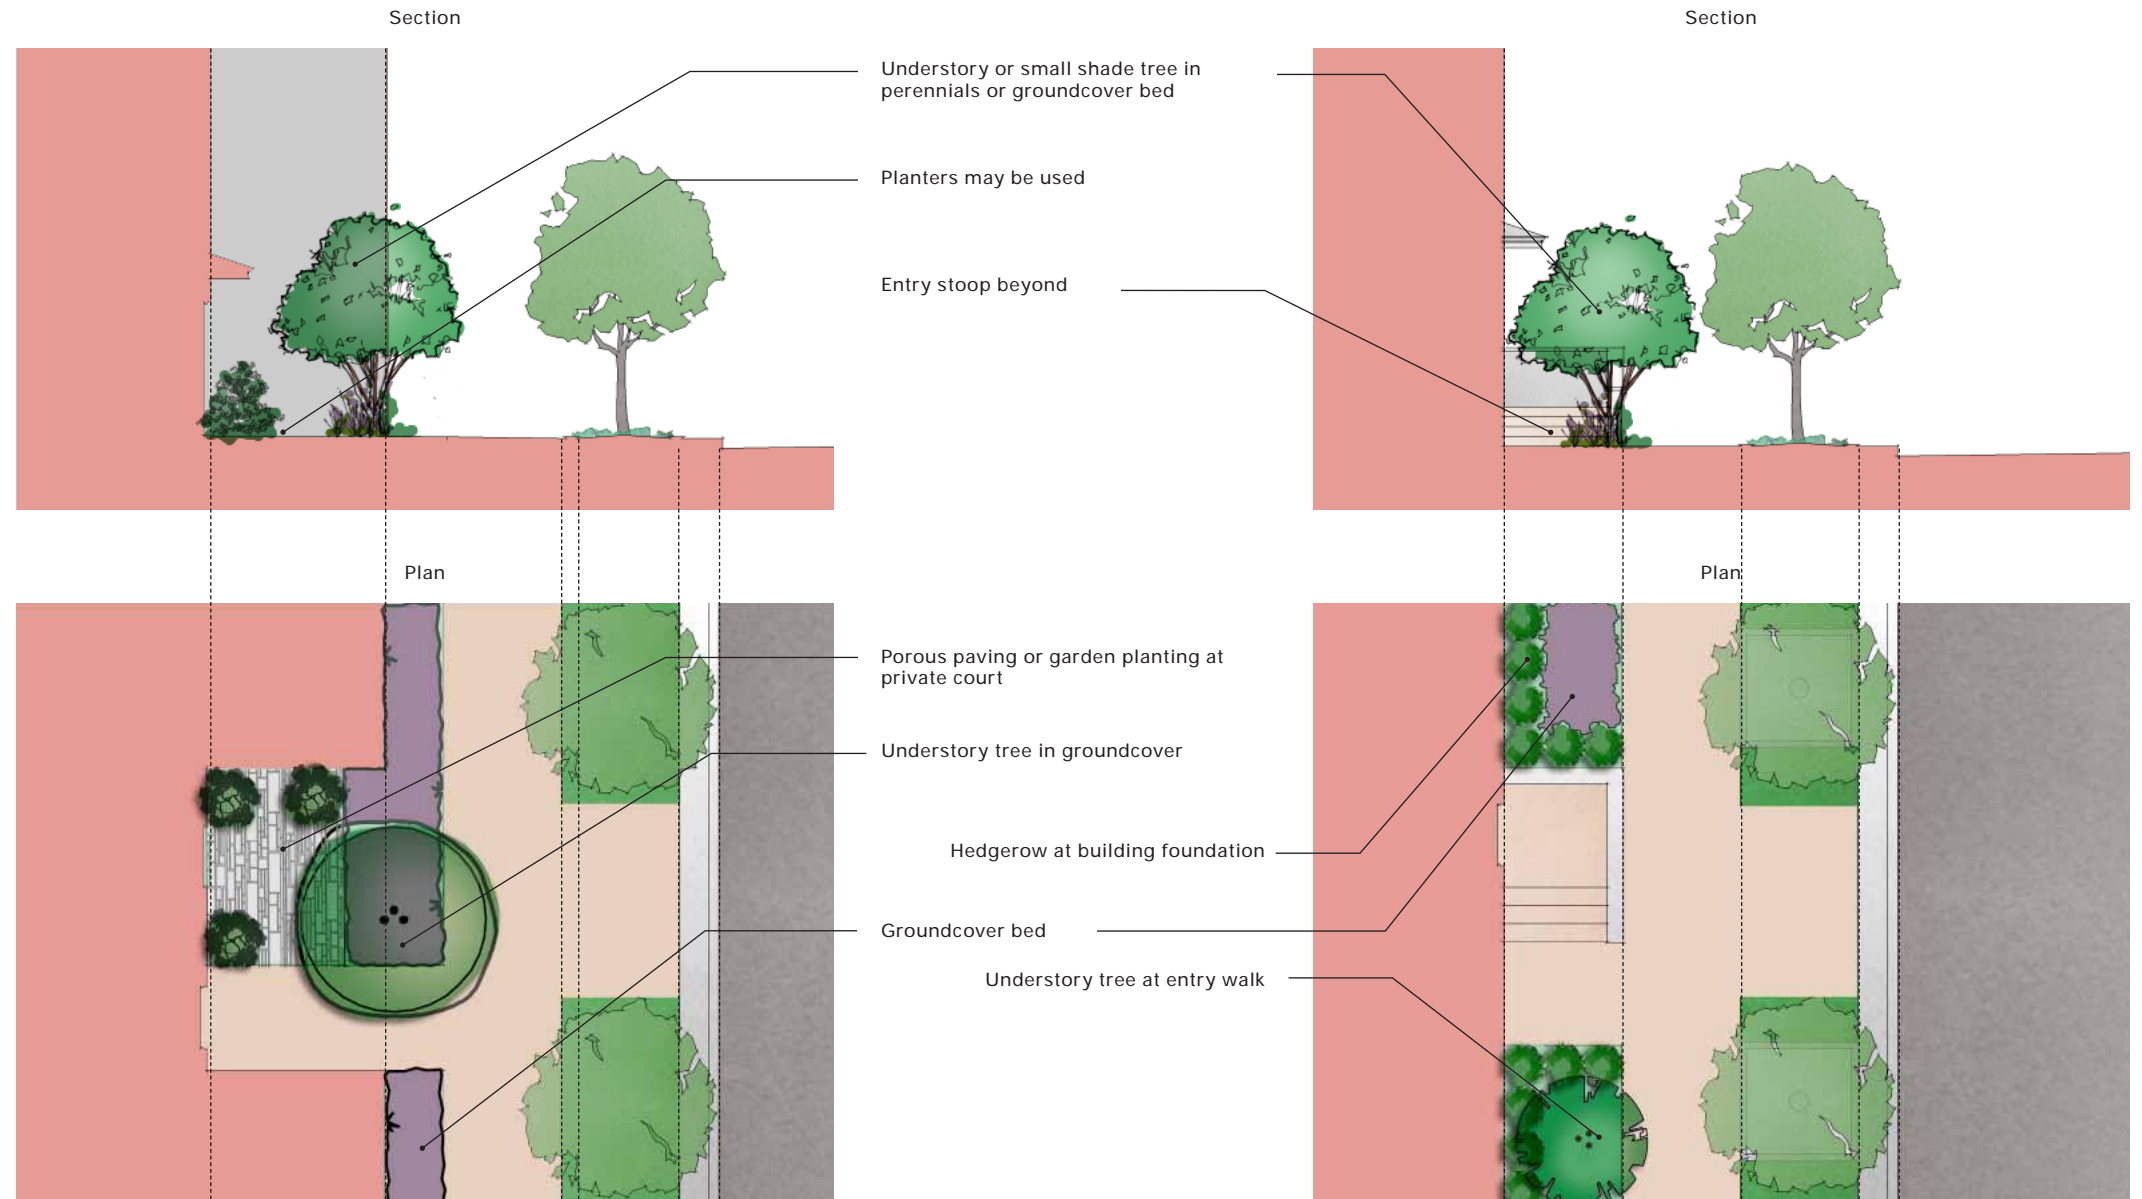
Typical residential frontage with forecourt showing proposed planting in plan and elevation
